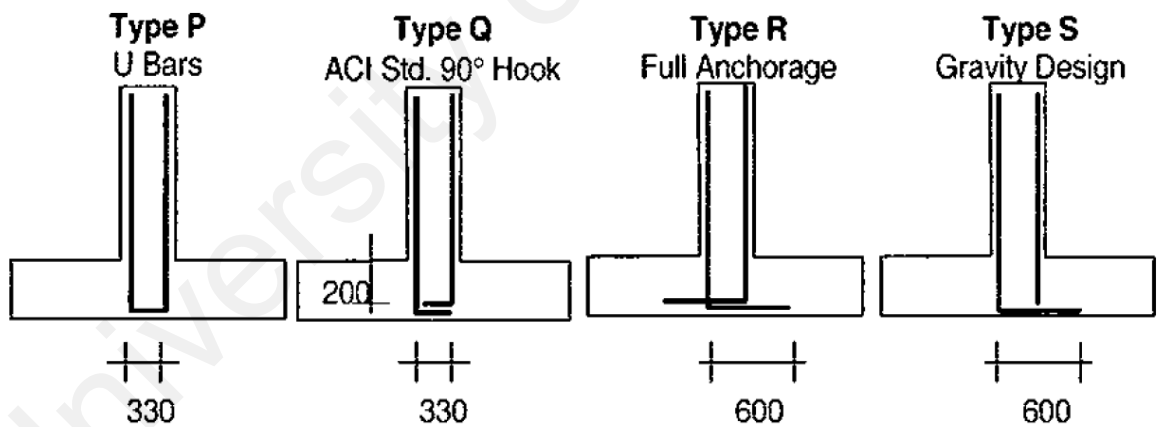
Anchorage details in beam-column joints (Murty et al., 2003)
